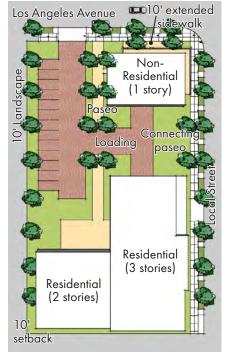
Horizontal Mixed-Use. (3D Model Plan Views)
